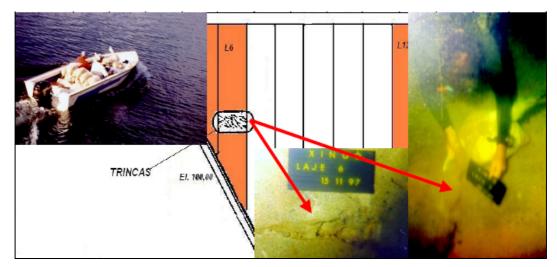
Underwater inspection of face cracks at Xingó Dam (Souza, 2007)
